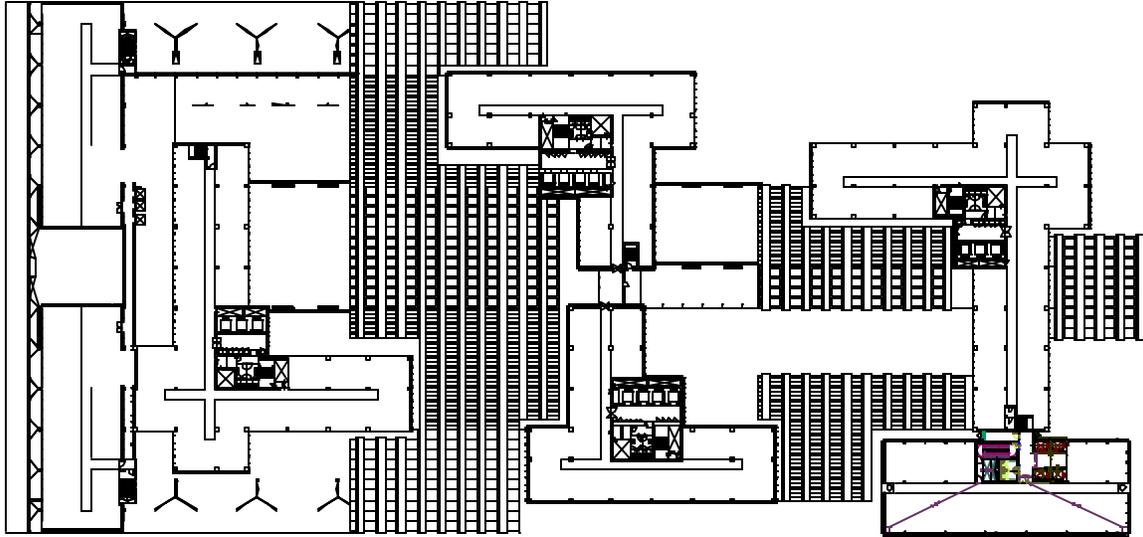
Fifth Floor Plan of WTC, not to scale (courtesy of KPFI)
